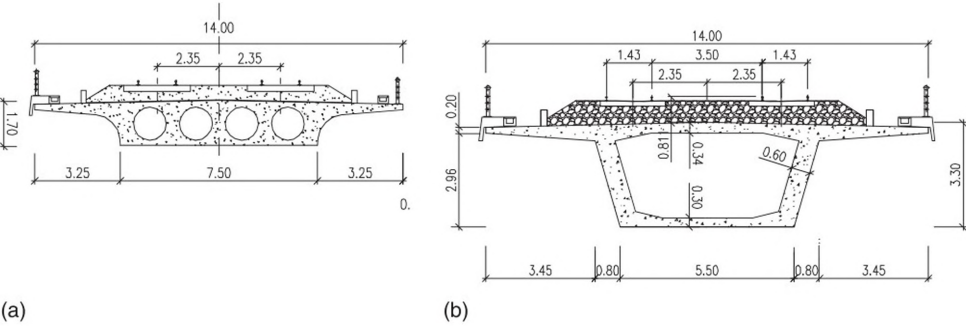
Typical bridge cross-sections for HSRL Viaducts of medium spans. (a) voided slab (b) box girder.
